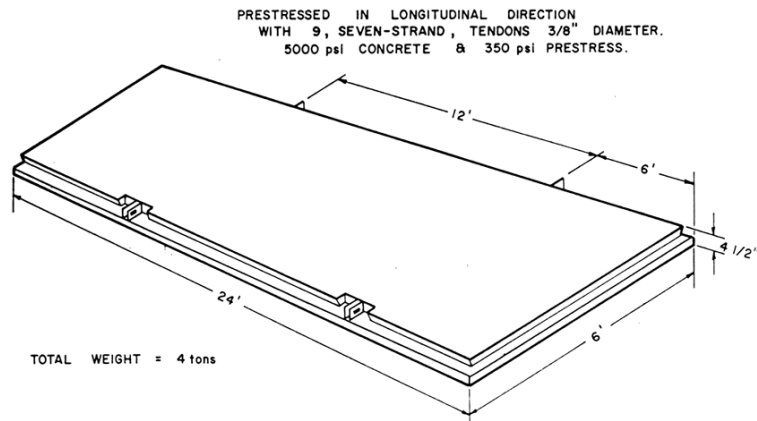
Precast slab with tongue and fork connections (Ref 1)
